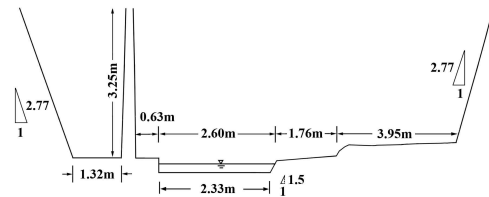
Cross-section view of observation site (Kwan-nam Bridge).
